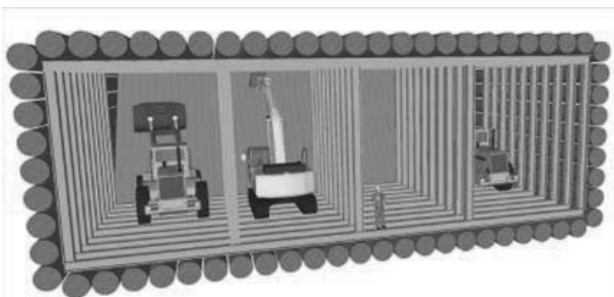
Schematic view of the excavation method for Beach Road and Queen Street tunnels.
